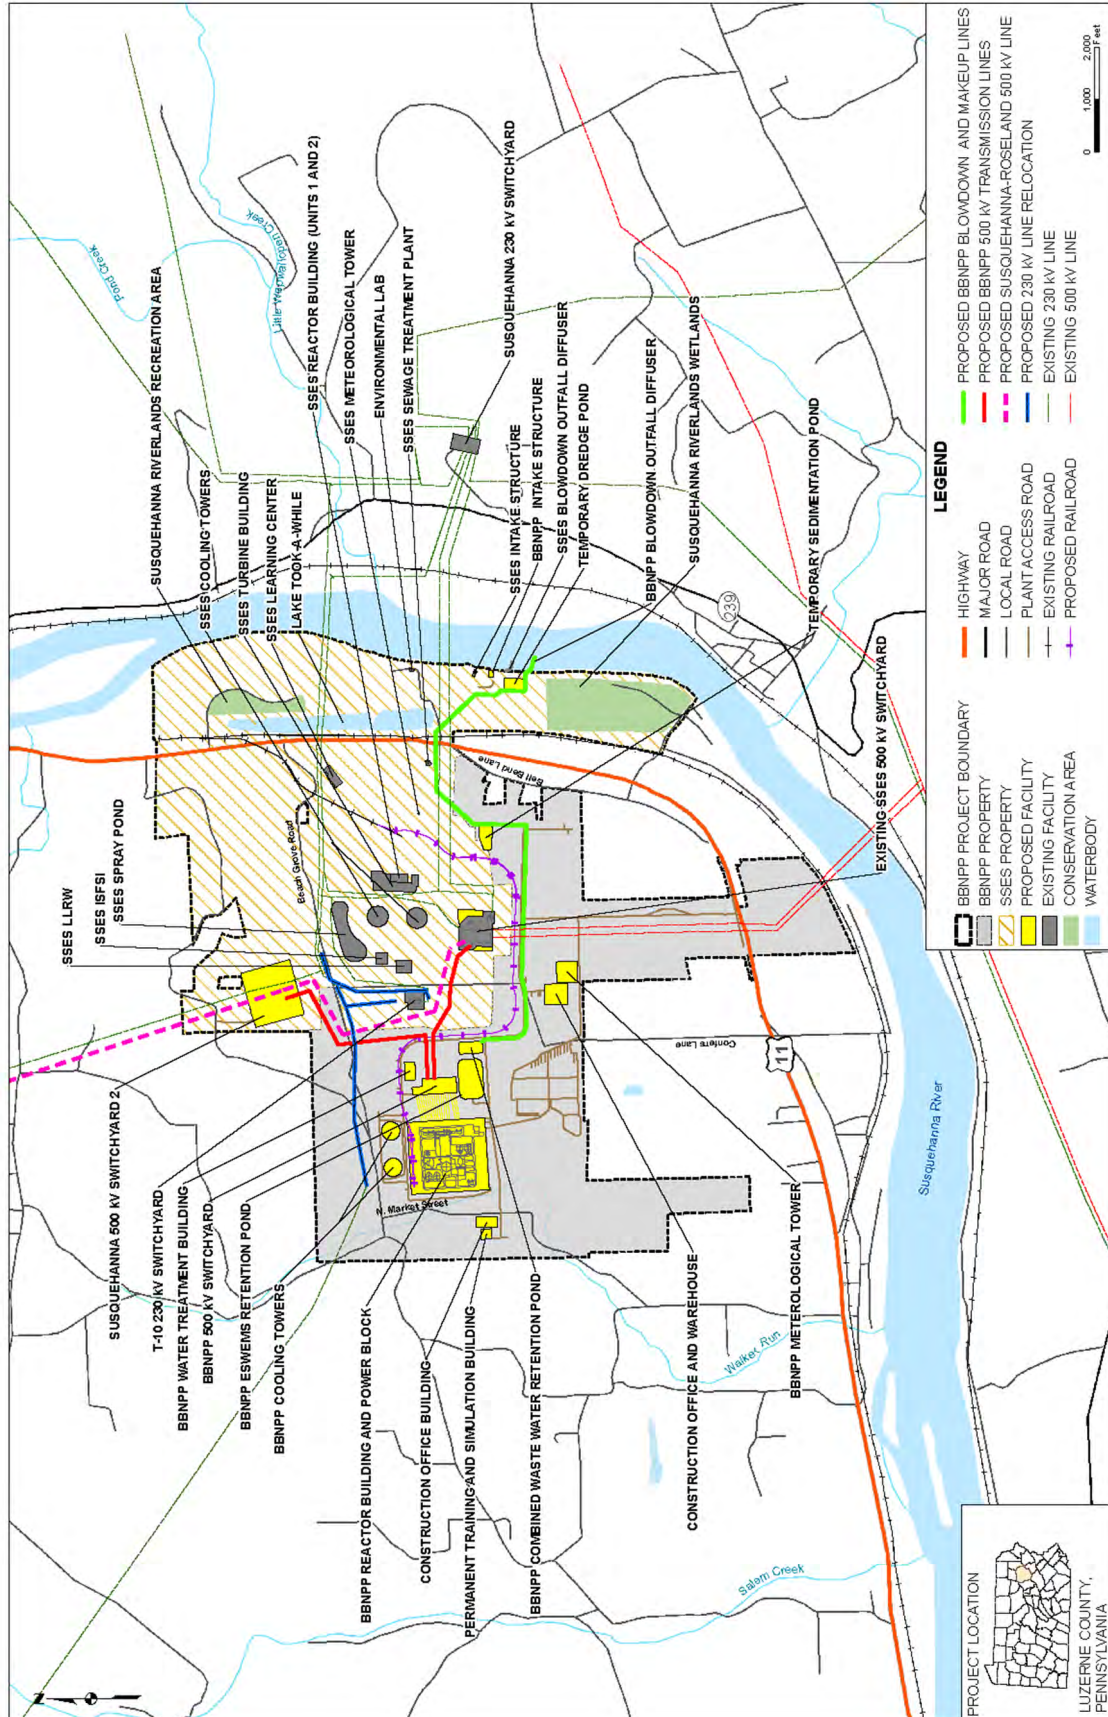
BBNPP Site and Proposed New Plant Layout
